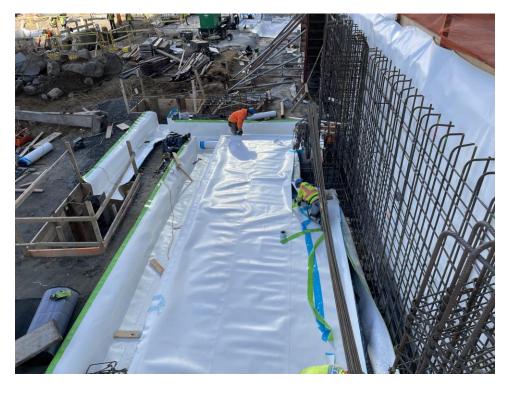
ECD installing waterproofing in the southeastern part of the site (WCG I, facing north).
